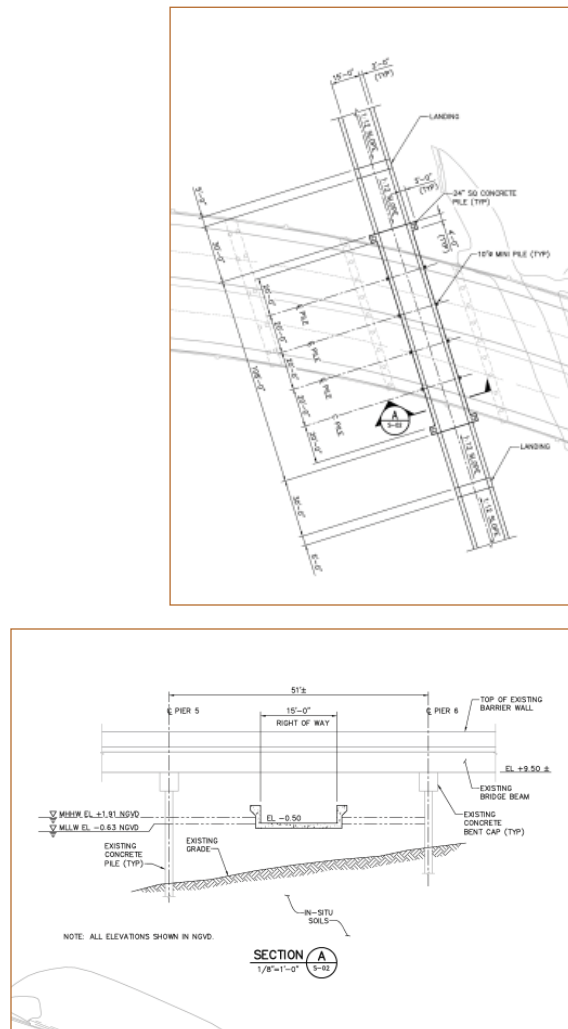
Plan and section views of Beneficial Drive Bridge under-bridge crossing.
